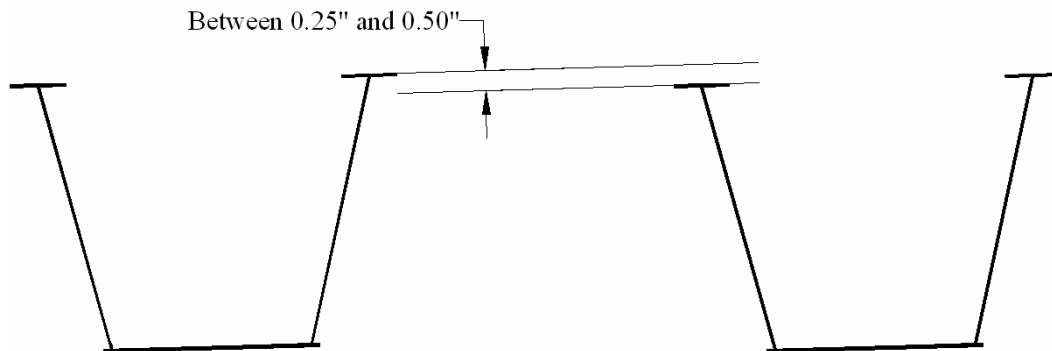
UTrAp rotation of the girders during deck pour without external bracing
